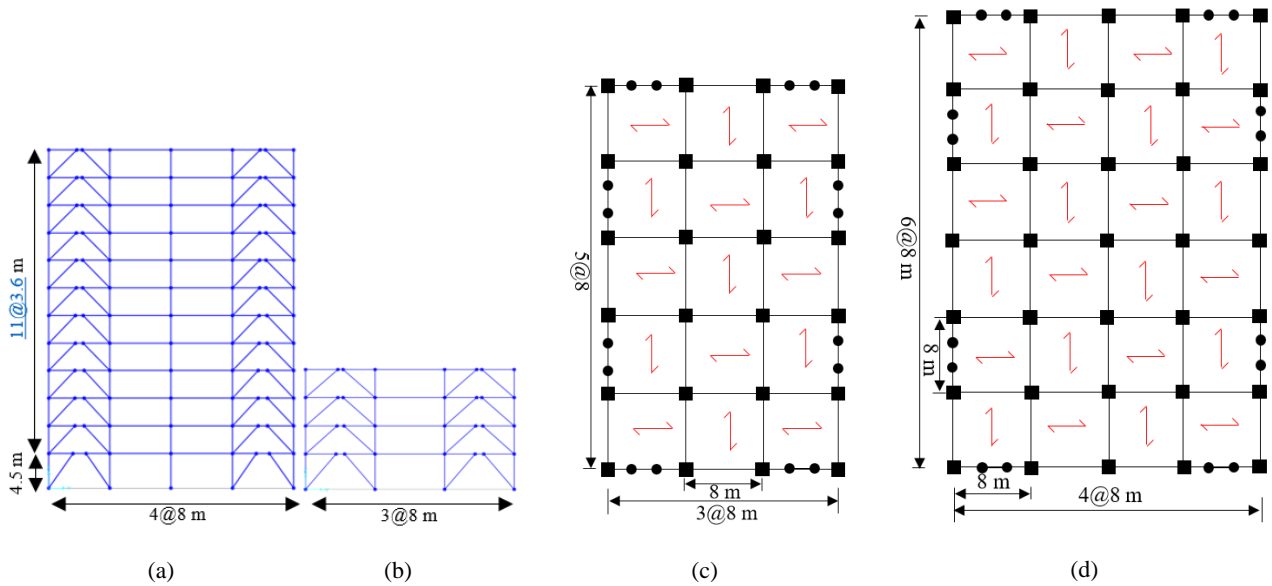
Presenting (a) elevation of 12-storey (b) elevation of 4-storey (c) plan layout of 4-storey, and (d) plan layout of 12-storey case study buildings.
